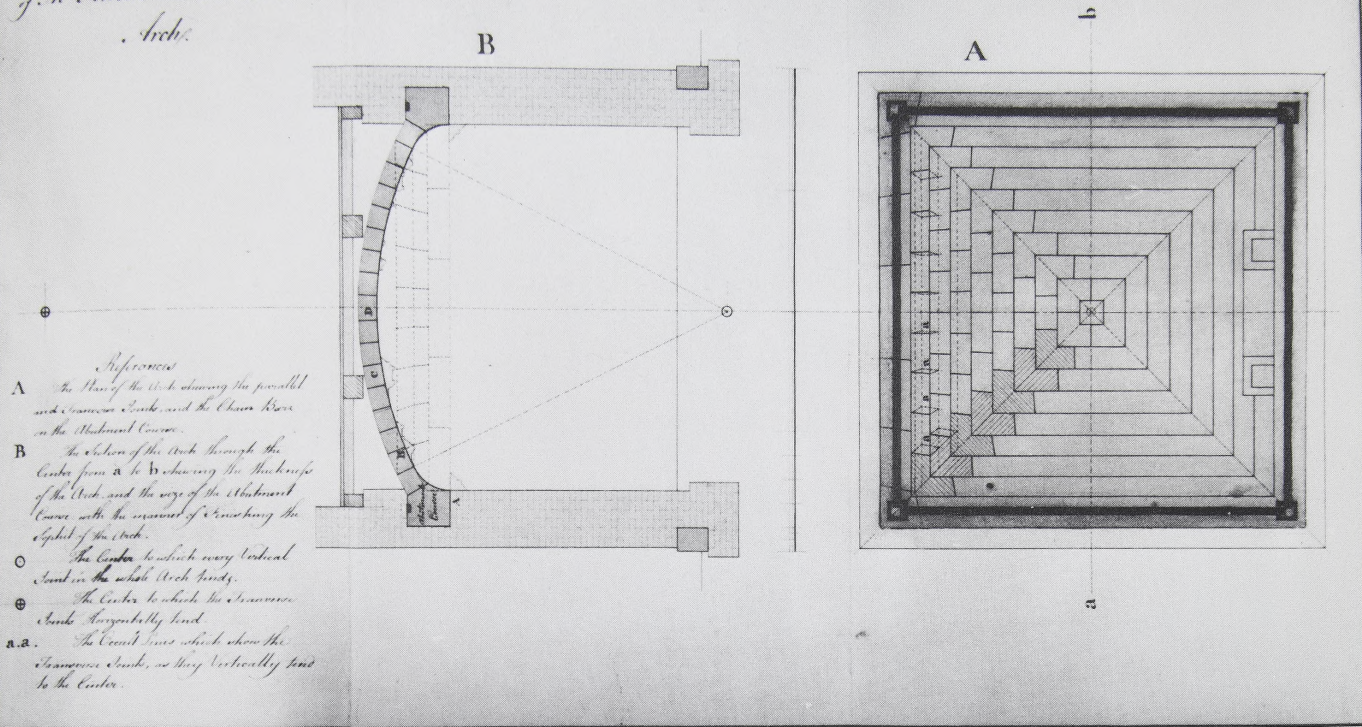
James Arrow. Plan and section of a fireproof arch, 1768
